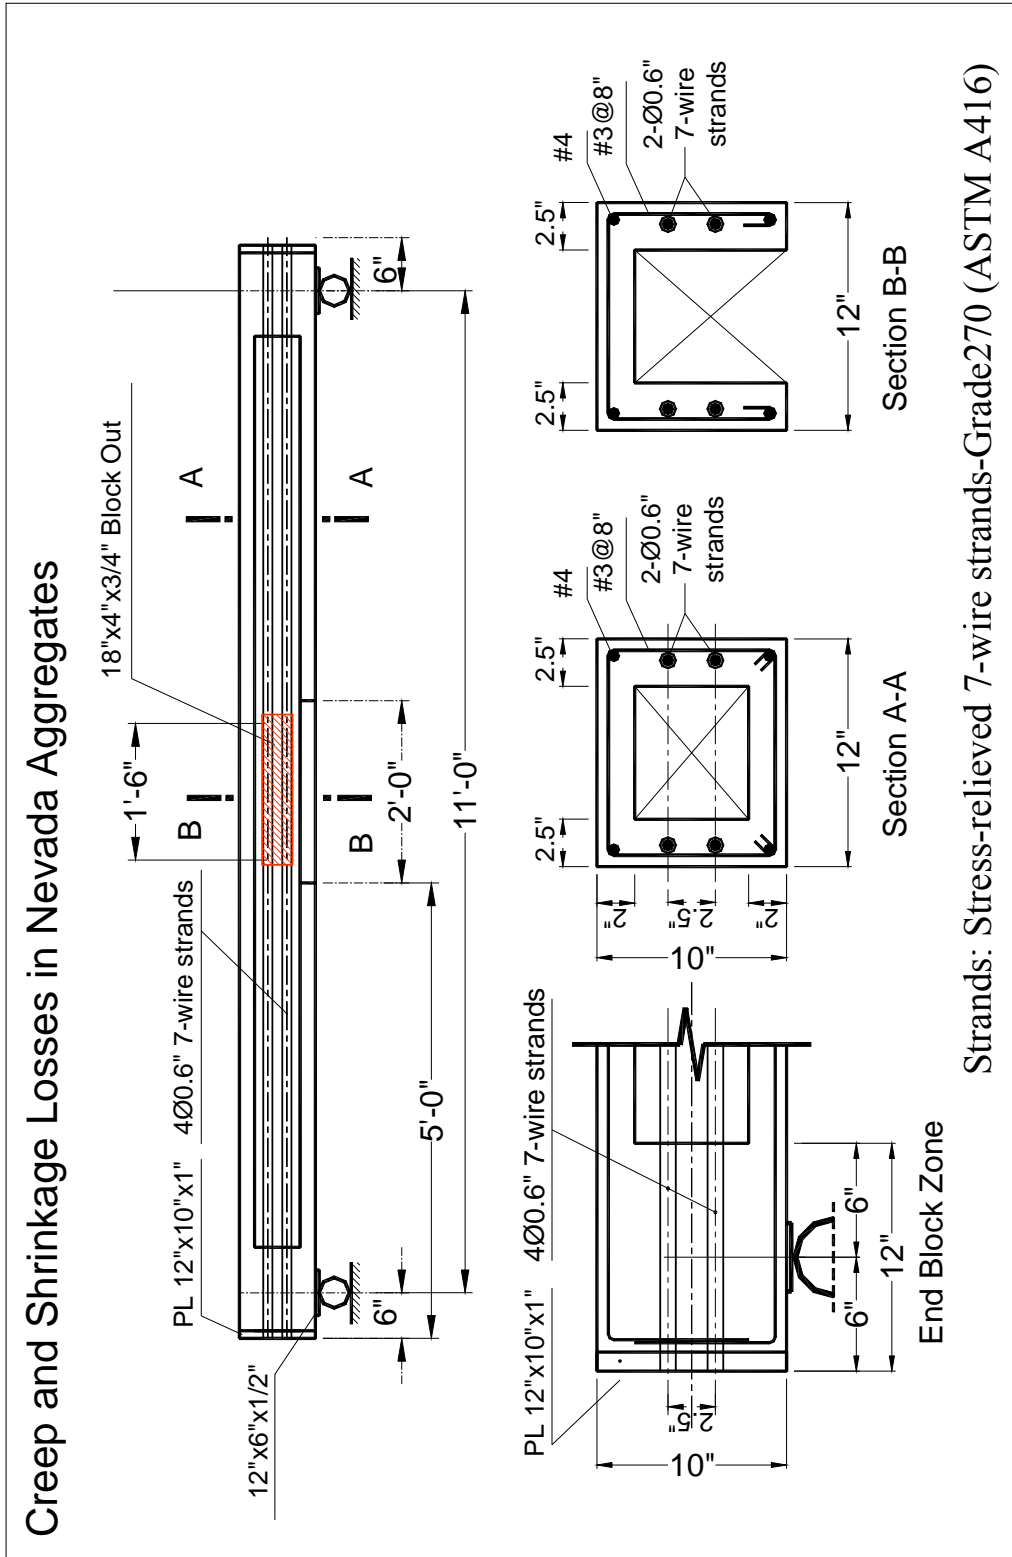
Box Girder Plans in U.S. Customary Units
